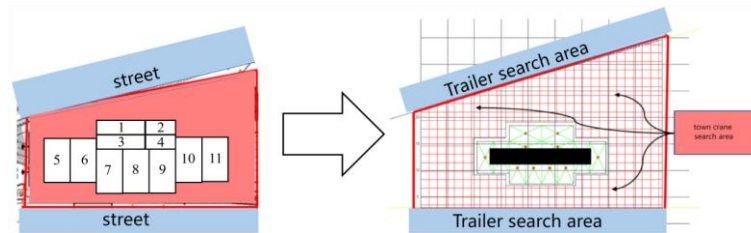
Setting up search areas for tower cranes and trailers based on the initial construction plan
